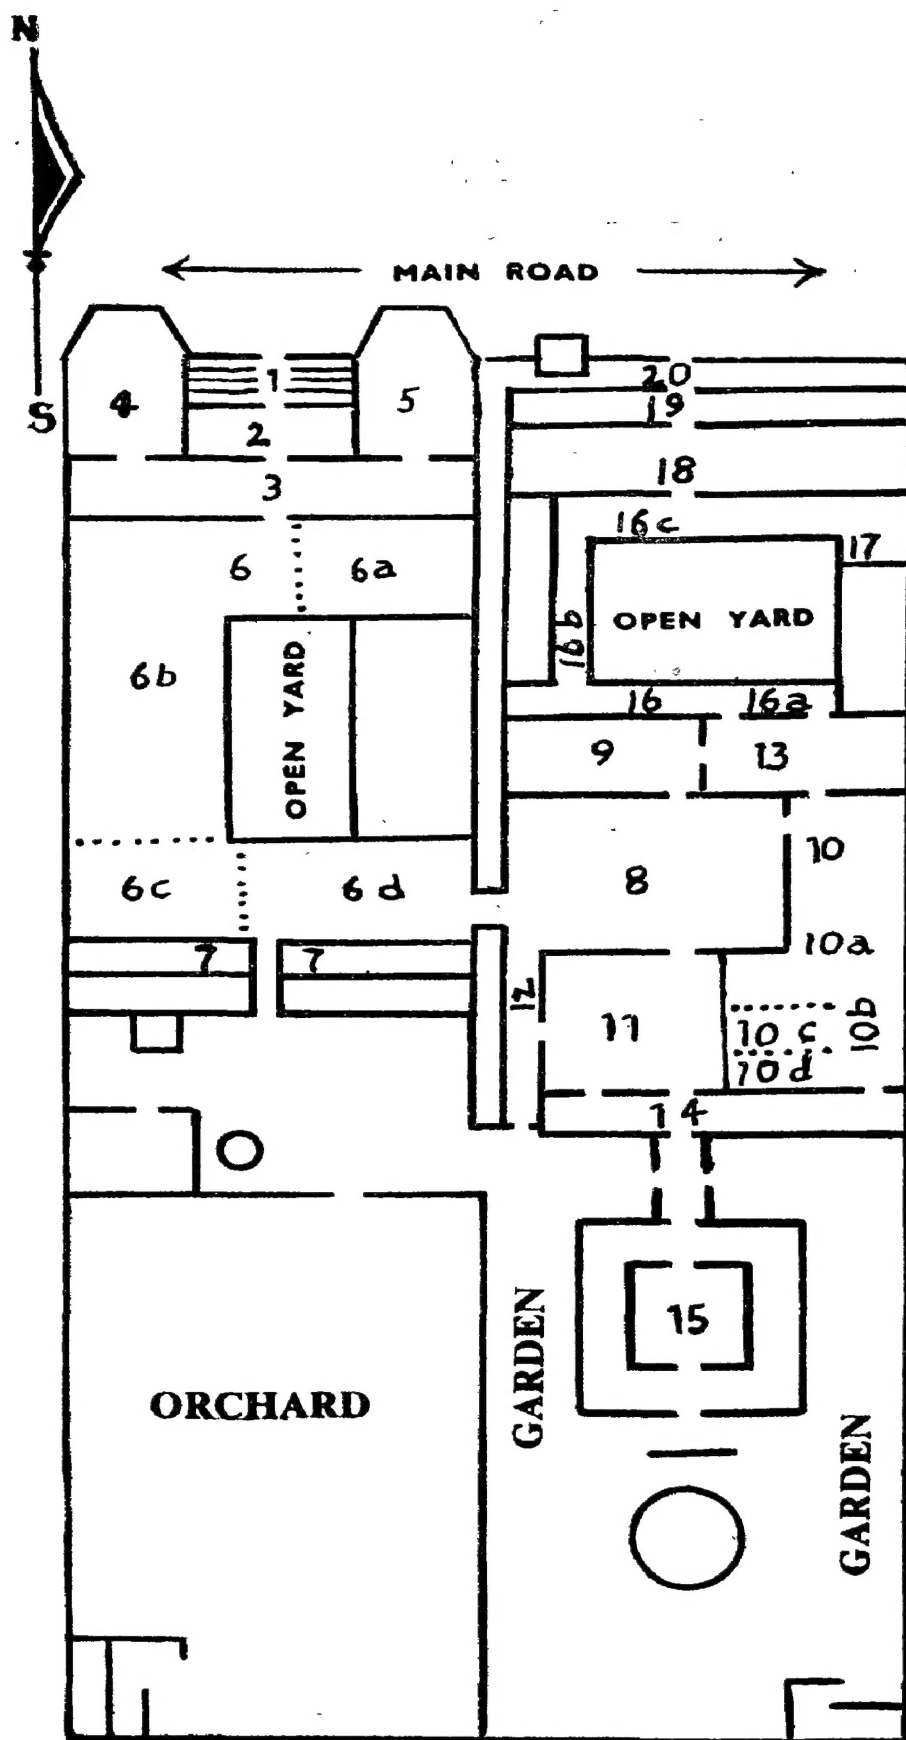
PLAN OF THE MUSEUM BUILDINGS—NOT TO SCALE.
